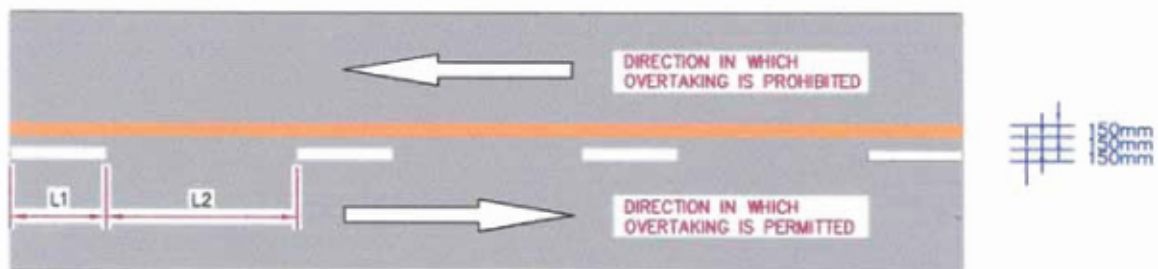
Typical Pavement Markings for Approach to Bridges
